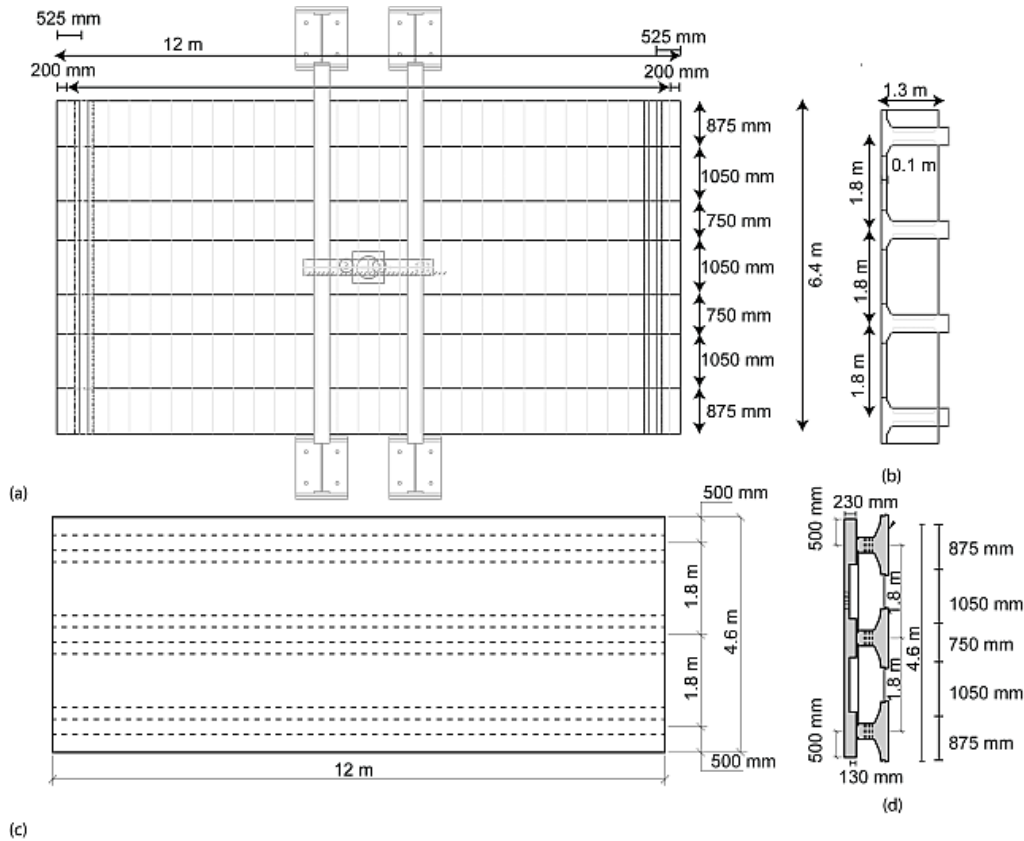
Test setup for fatigue experiments: (a) top view of first series, showing four girders and three decks; (b) section of specimen of first series; (c) top view of second series, showing three girders and two decks; (d) section of specimen of second series.
